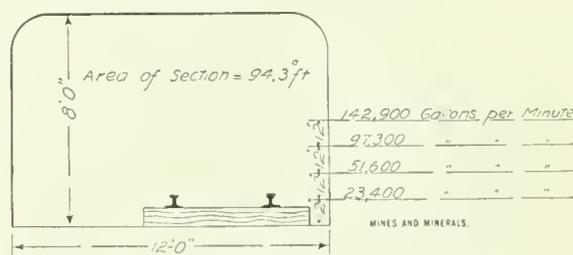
CROSS-SECTION OF DRAINAGE TUNNEL
